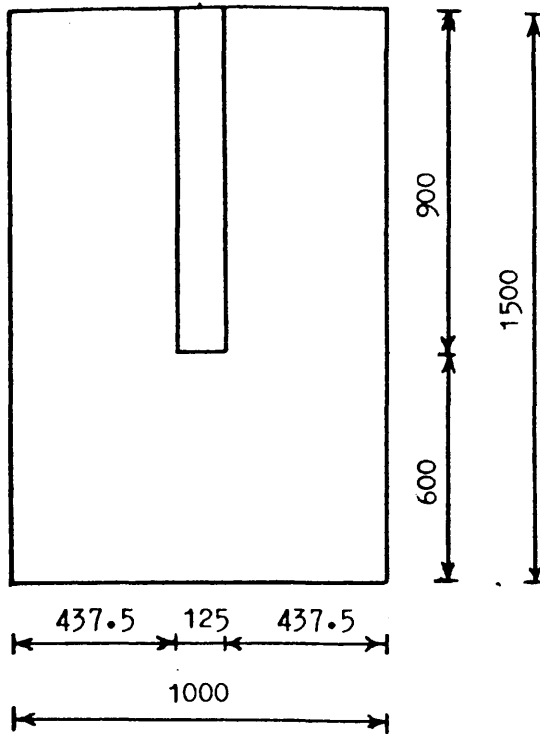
Plan and dimensions of models PS2 and PS3
